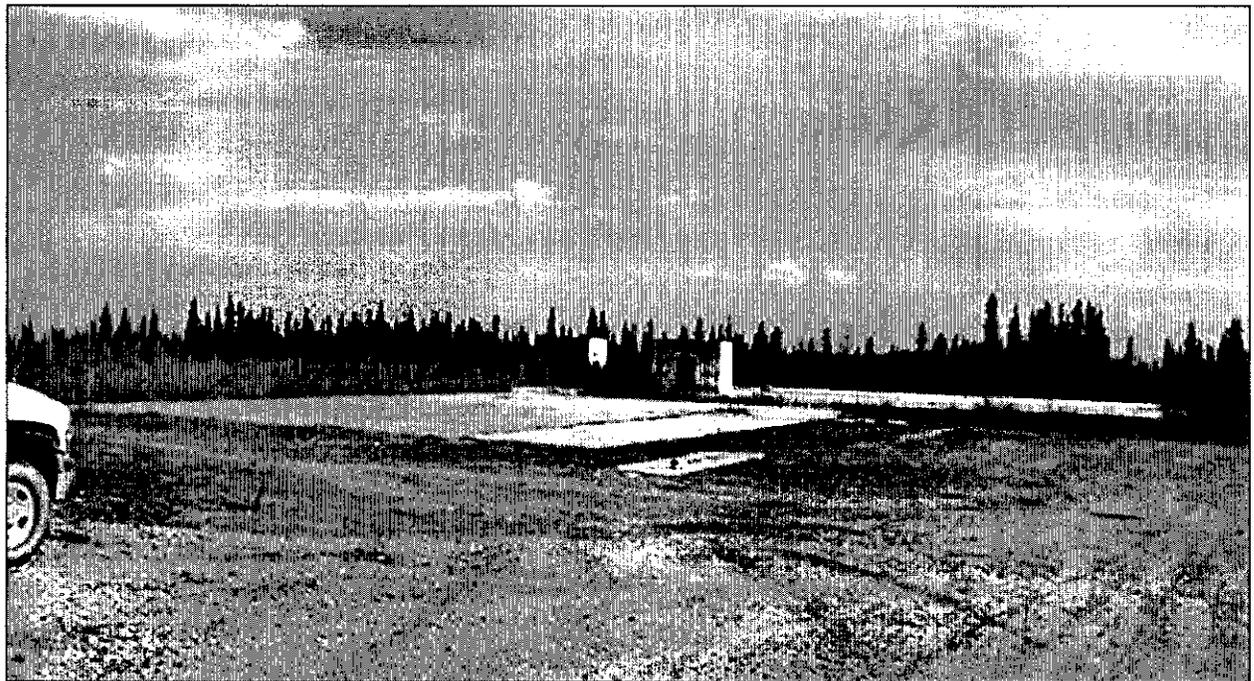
Foreground, warm storage foundation. Background, ADA foundation. View northeast.
